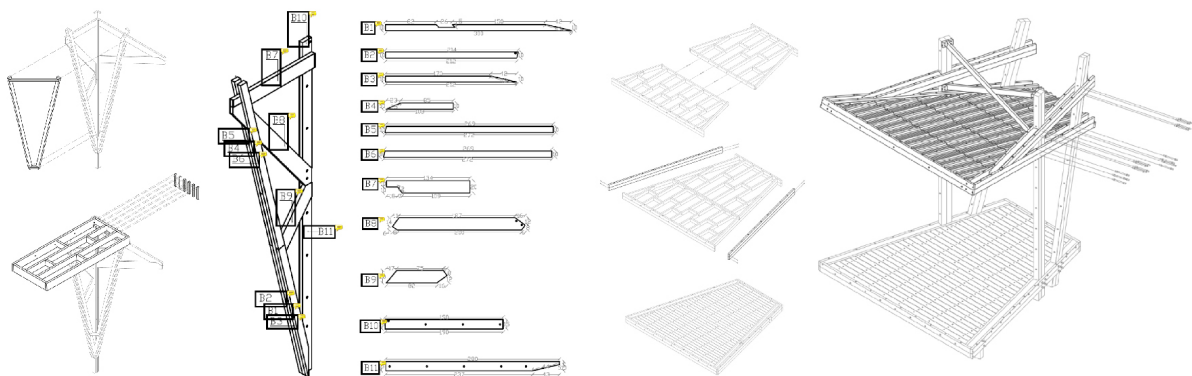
Drawings details prepared as part of the construction booklets: Pier 2 (left) - Modular (right). Source: (Design Studio Students 2023)
